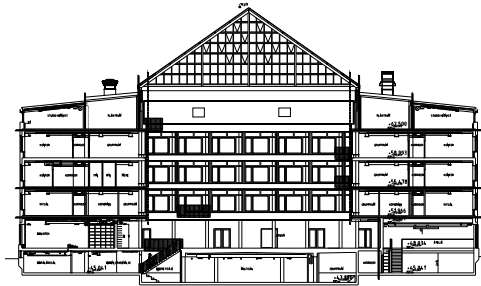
Section D-D drawing, Chalmers Architectural building. Provided by WHITE architects.
